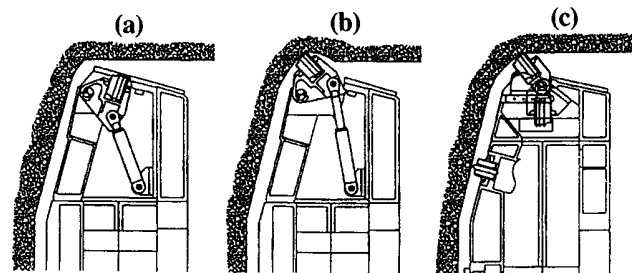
Phases of cutter head expansion: (a) overcutting rollers retracted; (b) extending overcutting rollers; (c) overcutting rollers fully extended
